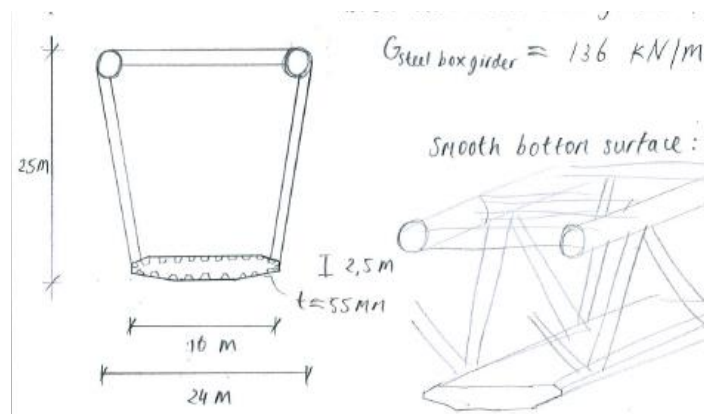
STEEL BOX GIRDER AS BOTTOM FLANGE
